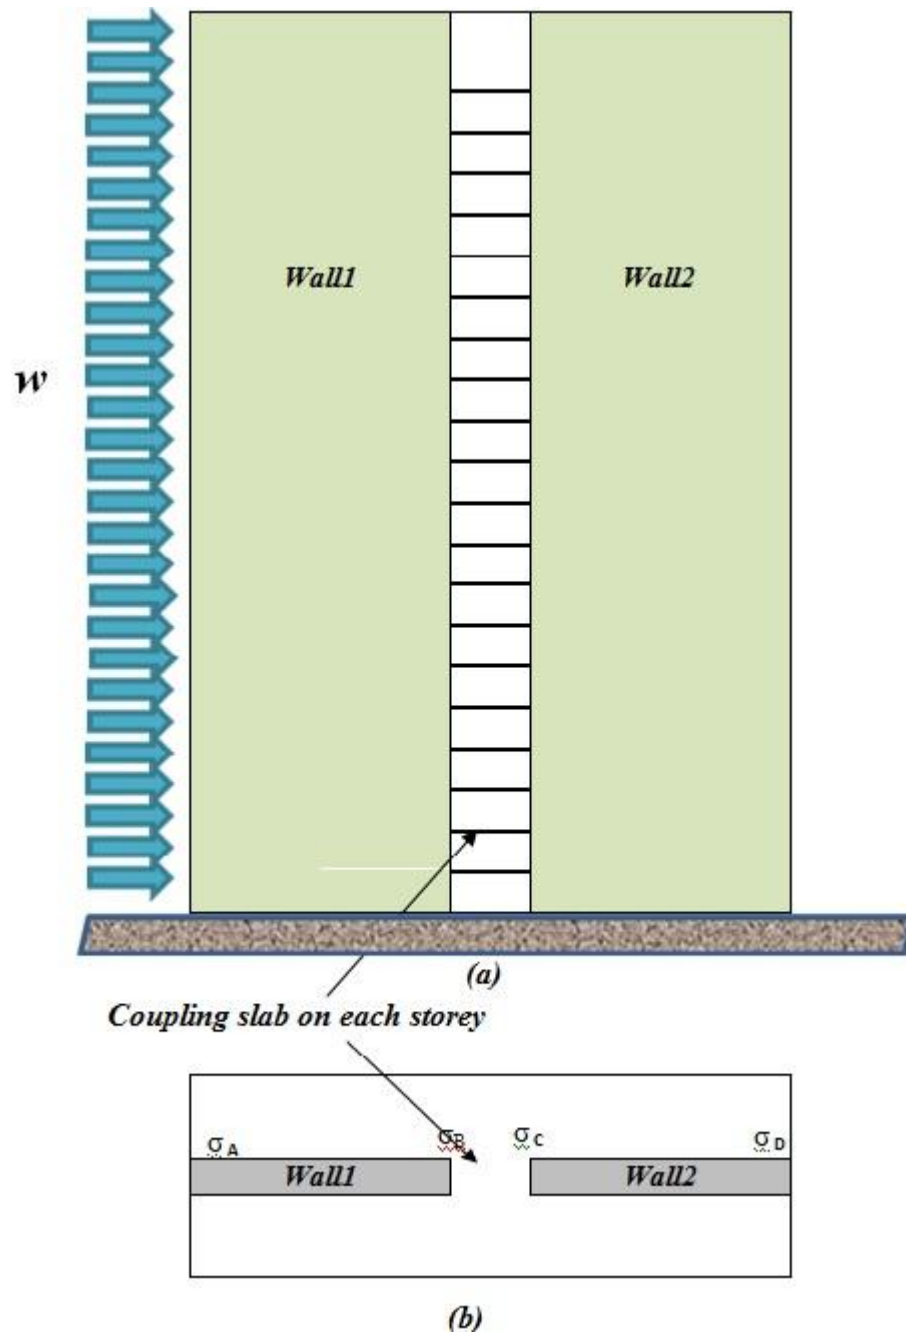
(a) Side view of the 20 storey building with uniformly distributed static wind load
